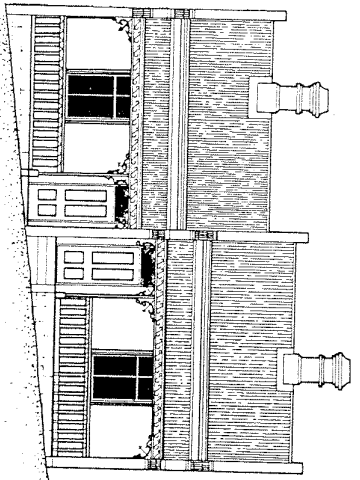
Retain the vertical proportions of elements such as windows and doors on the street facade
